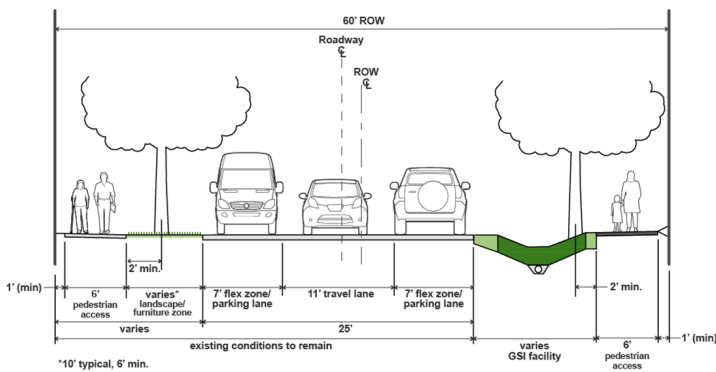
D Curbless Neighborhood Yield street type 60' ROW. Cross section showing where bioretention bulbs out into the flex zone/planting strip.
